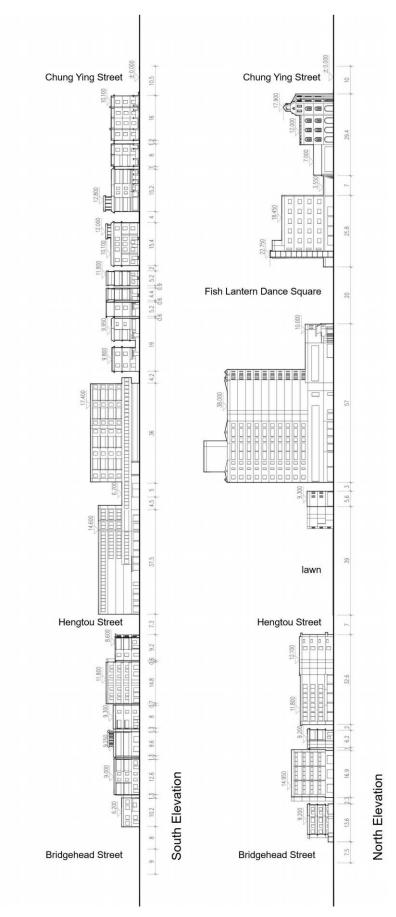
Elevation of the Street Walls of Living Streets (Source: Drawn by the Author)
